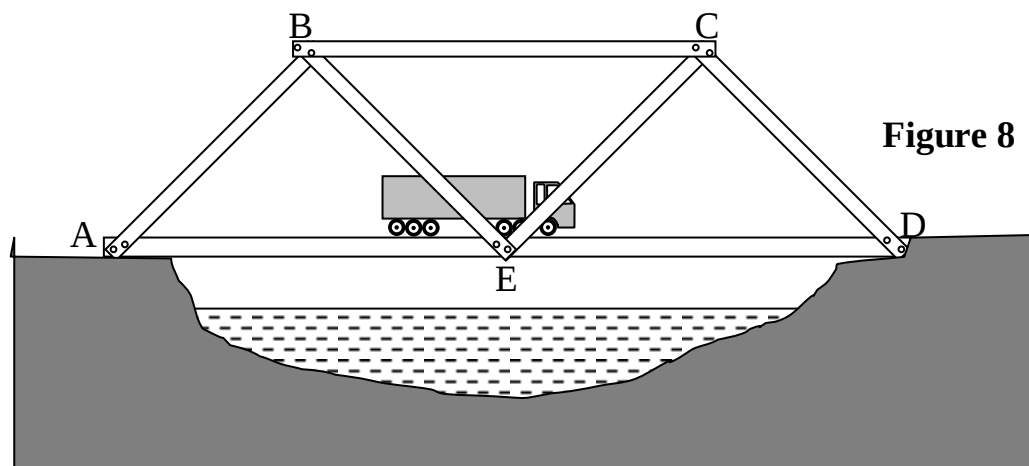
shows a bridge made of several girders. Name any two struts and two ties. (02 marks)
